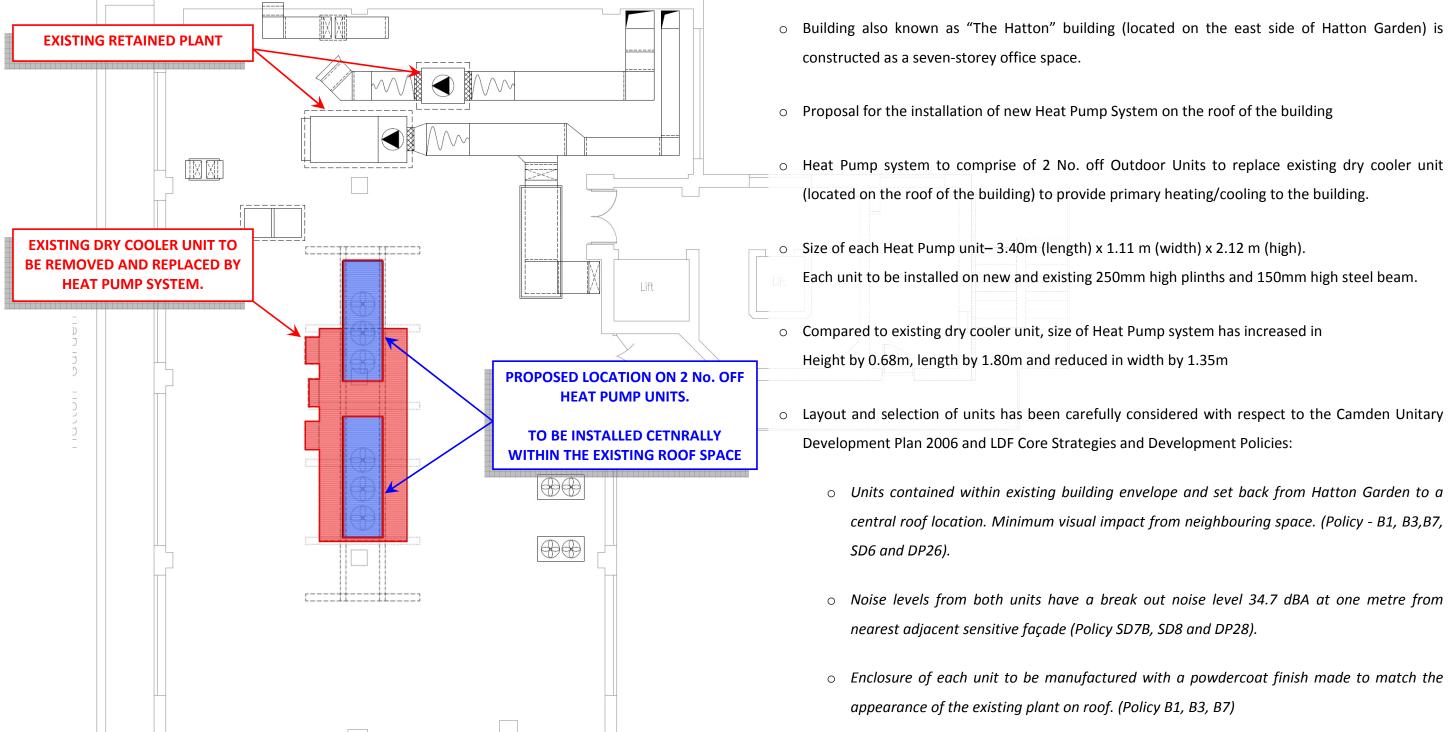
Roof Plan of "The Hatton" (Not to Scale)
